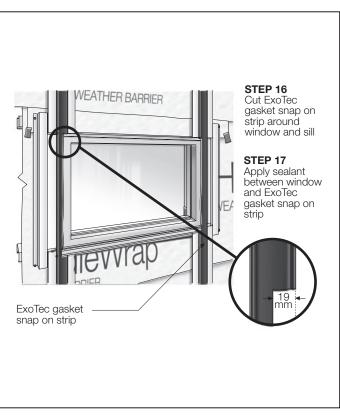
INSTALLATION OF SNAP ON STRIP
